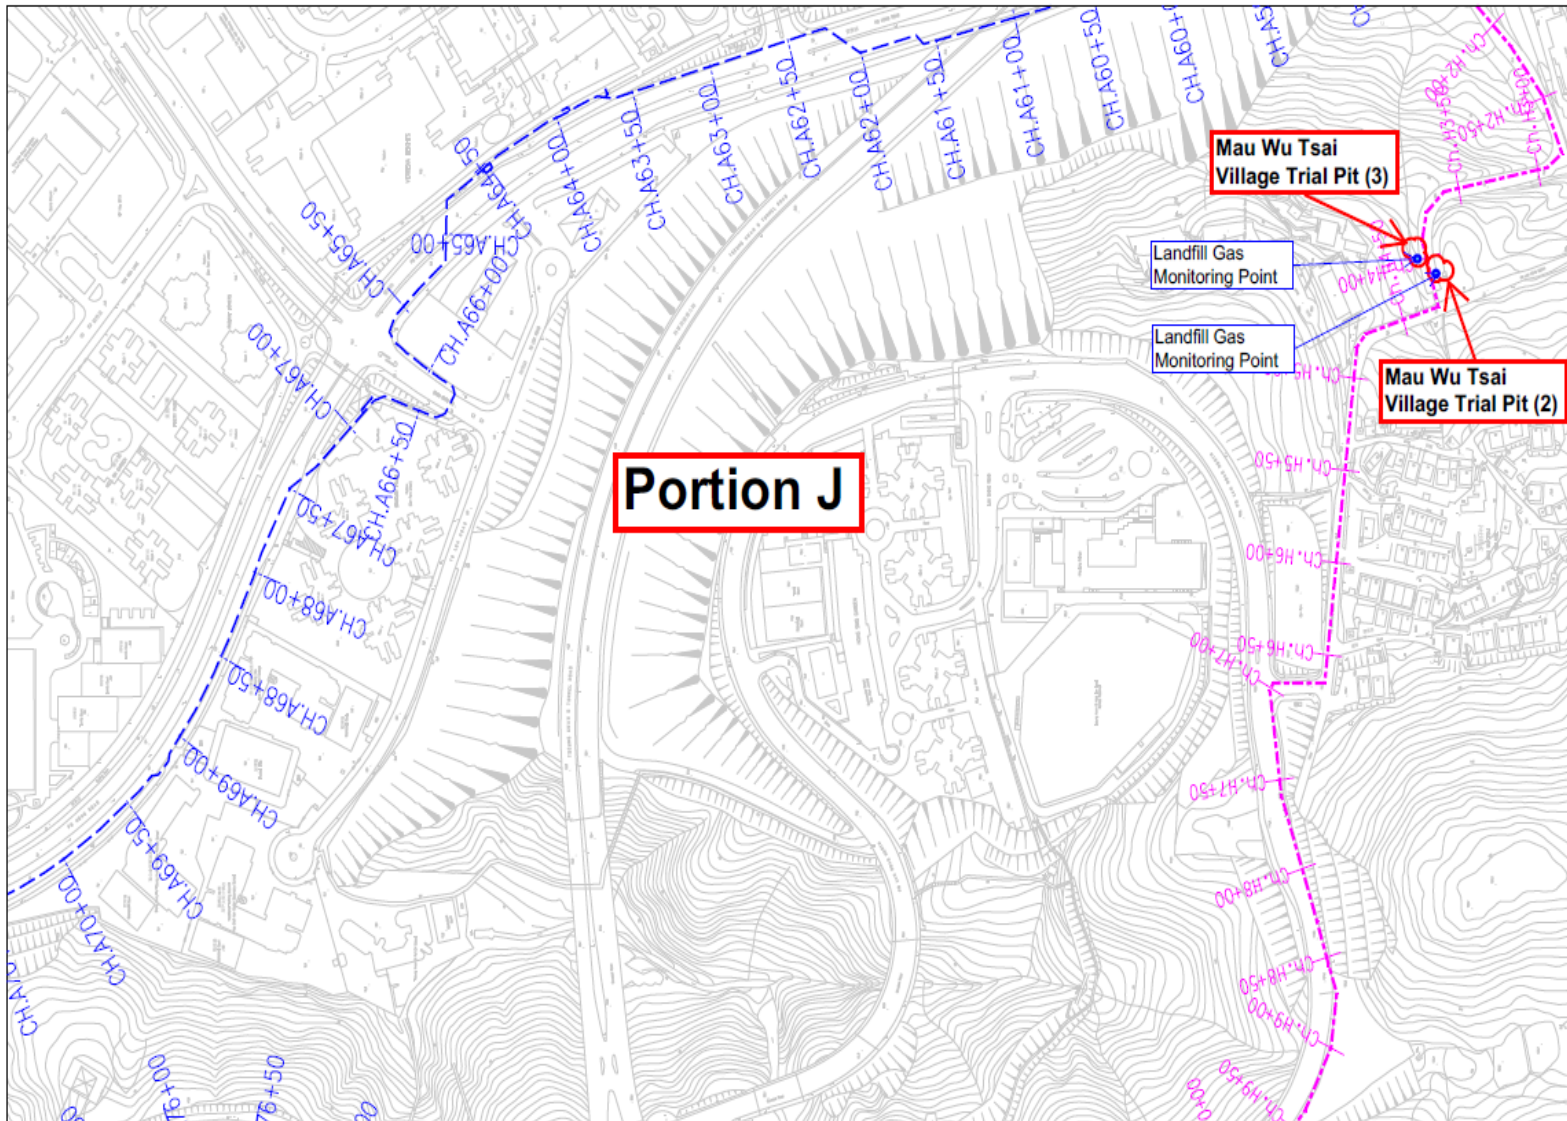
Location Plan for Portion J - Mau Wu Tsai 3 (Po Lam South Road 3)
